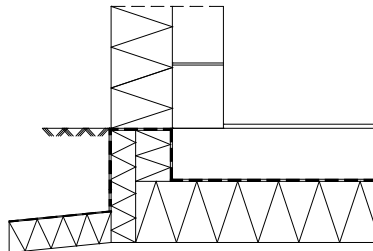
A fragment of a foundation slab joined with an external wall (Source: own elaboration)
